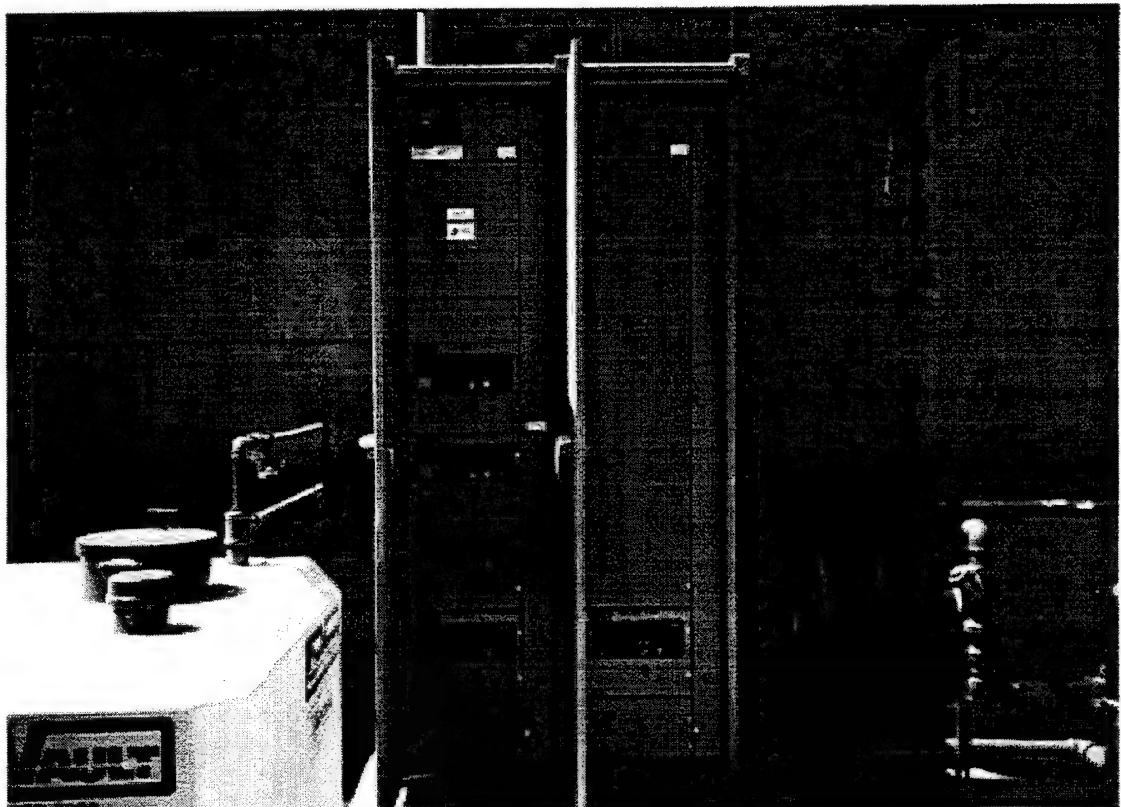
Auxiliary Machinery Equipment Pad Local Power Panel.
